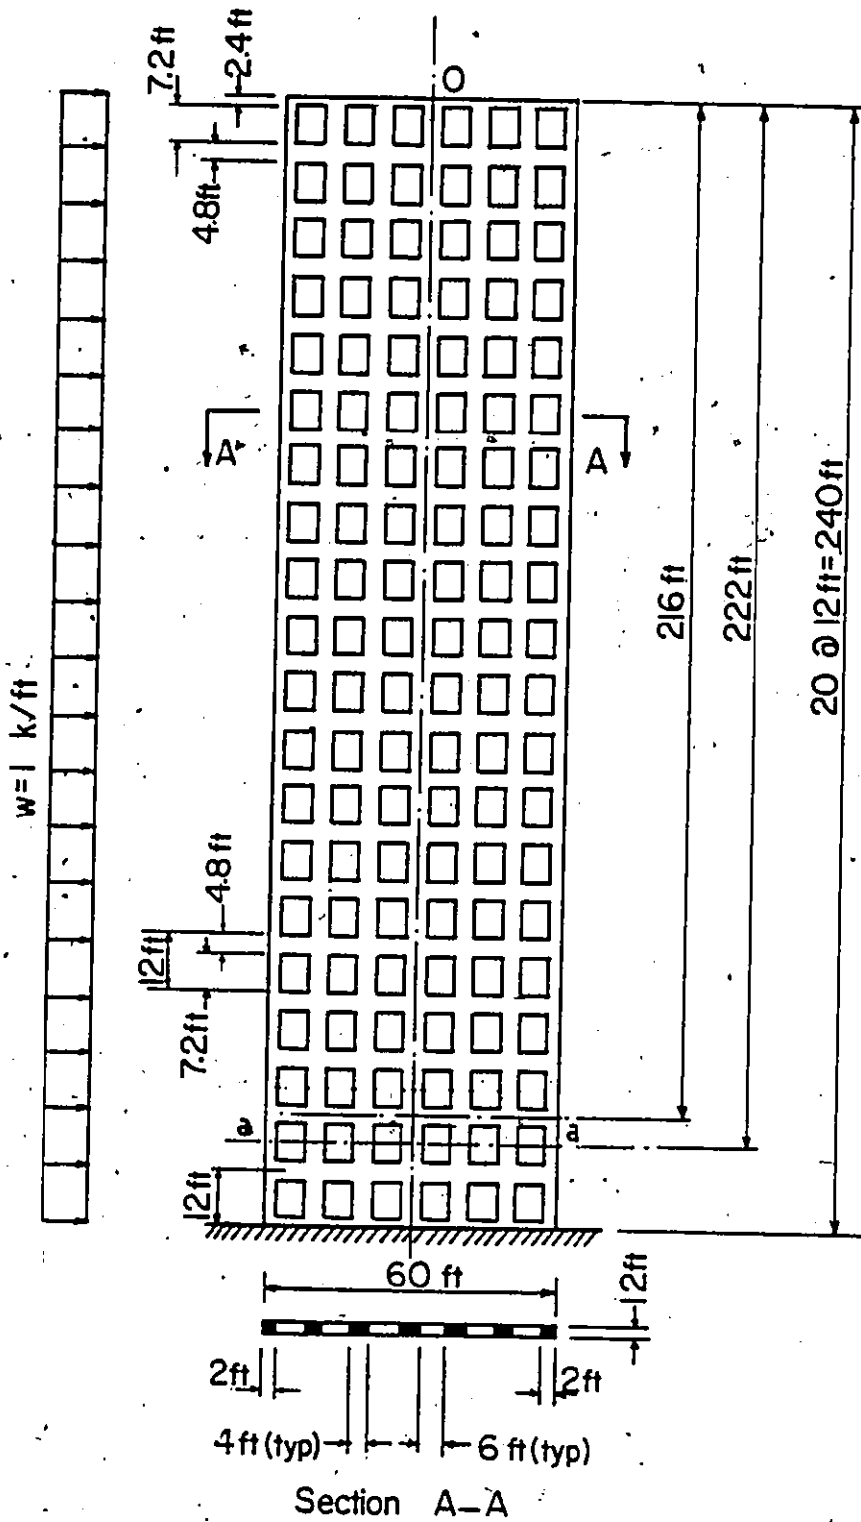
20-STOREY WALL-FRAME STRUCTURE OF KHAN AND STAFFORD-SMITH [61] - EXAMPLE 5-1
